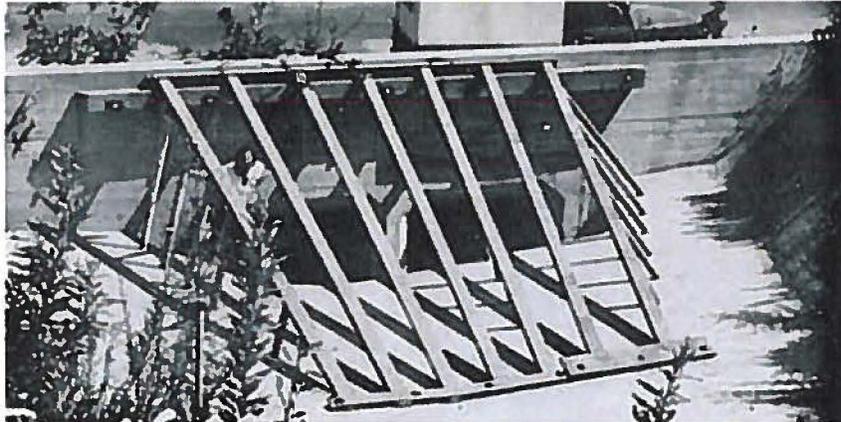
Steel grill debris rack with provision for cleanout afforded by concrete paved area in foreground.
